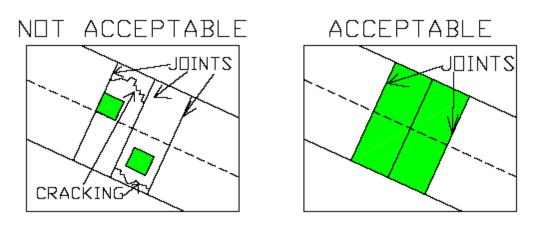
Example 4: In concrete pavements, remove sections to existing joints.
